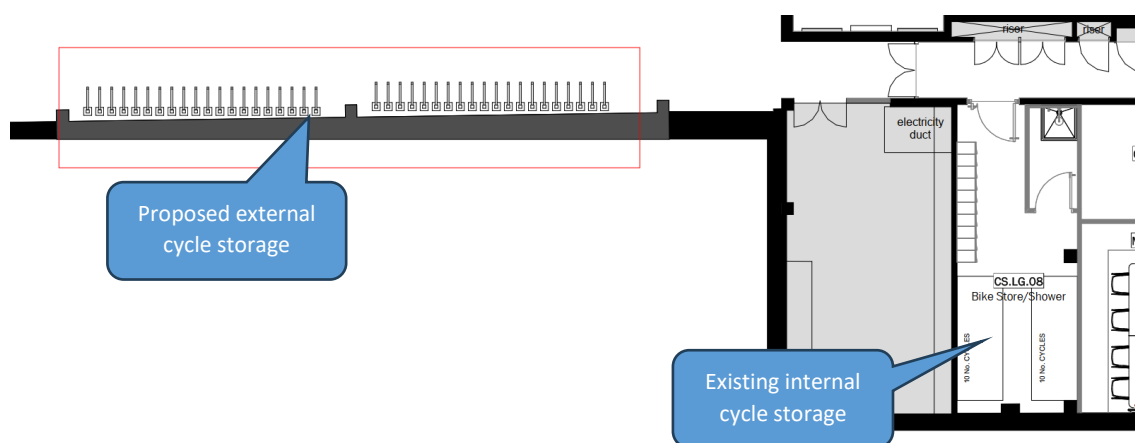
extract from Lower Ground Floor Plan showing existing location of cycle storage being replaced
